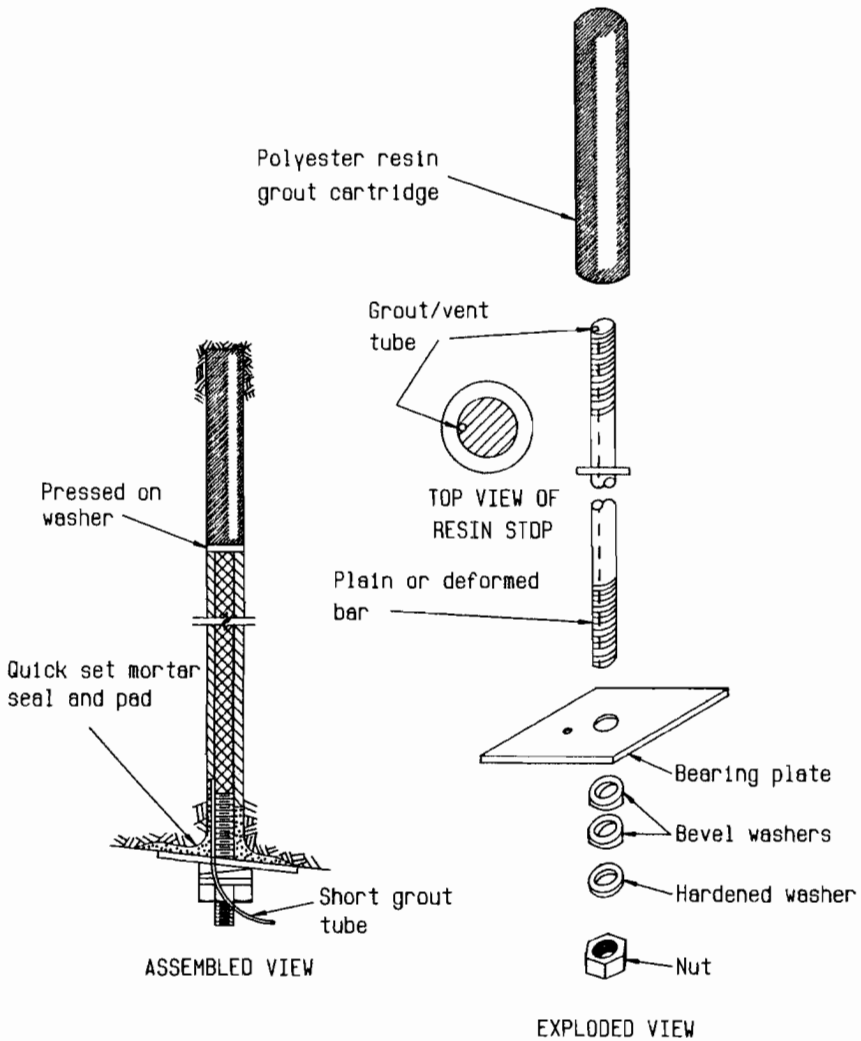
Cement Groutable Rock Bolt With Resin Anchor Stop and Integral Grout Tube (U.S. Army, 1980).
